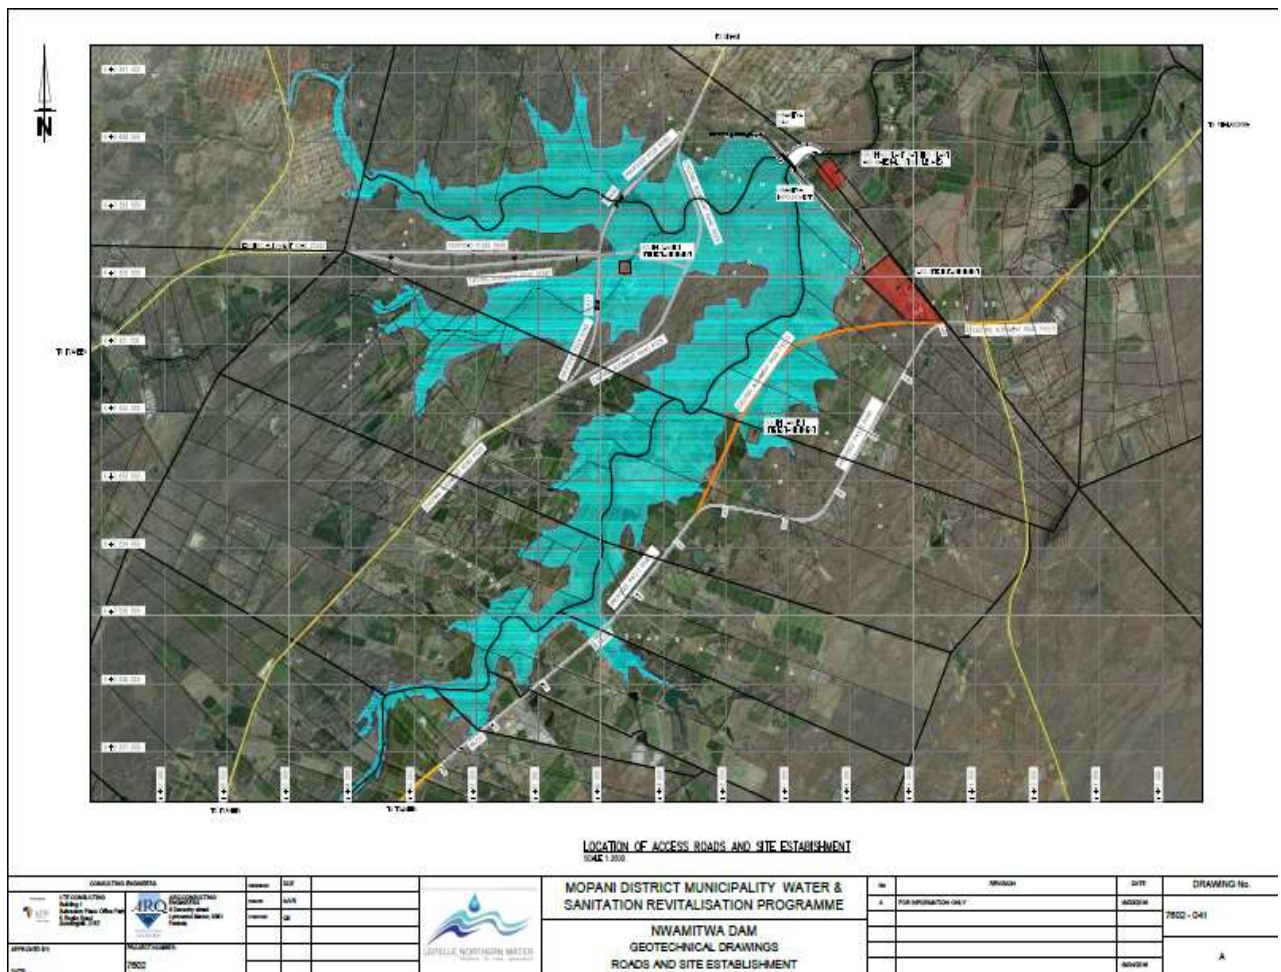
Layout Plan/Map of the Nwamitwa Dam Project showing proposed roads, Site camps and Impoundment area (provided by C&K Environmental).
